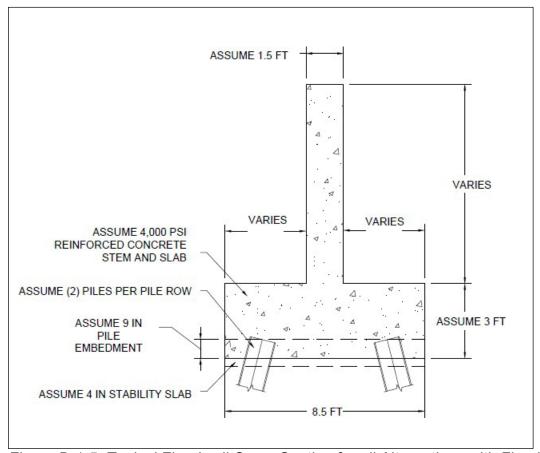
Typical Floodwall Cross Section for all Alternatives with Floodwalls
